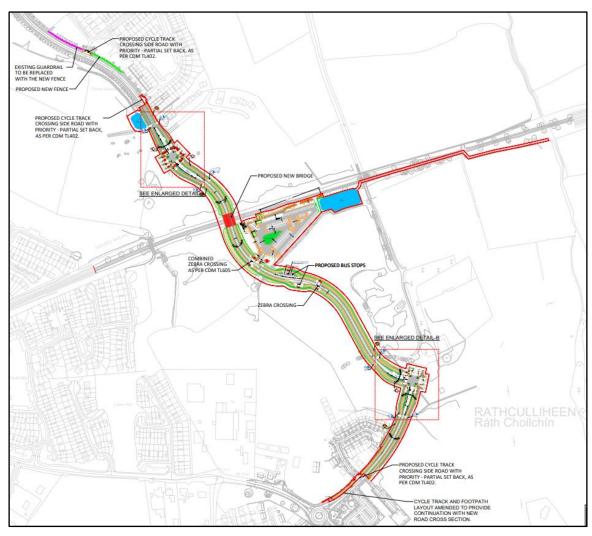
Finalised layout of The South – North Access Road (Source: O'Connor Sutton Cronin, dated 12.07.2024).
